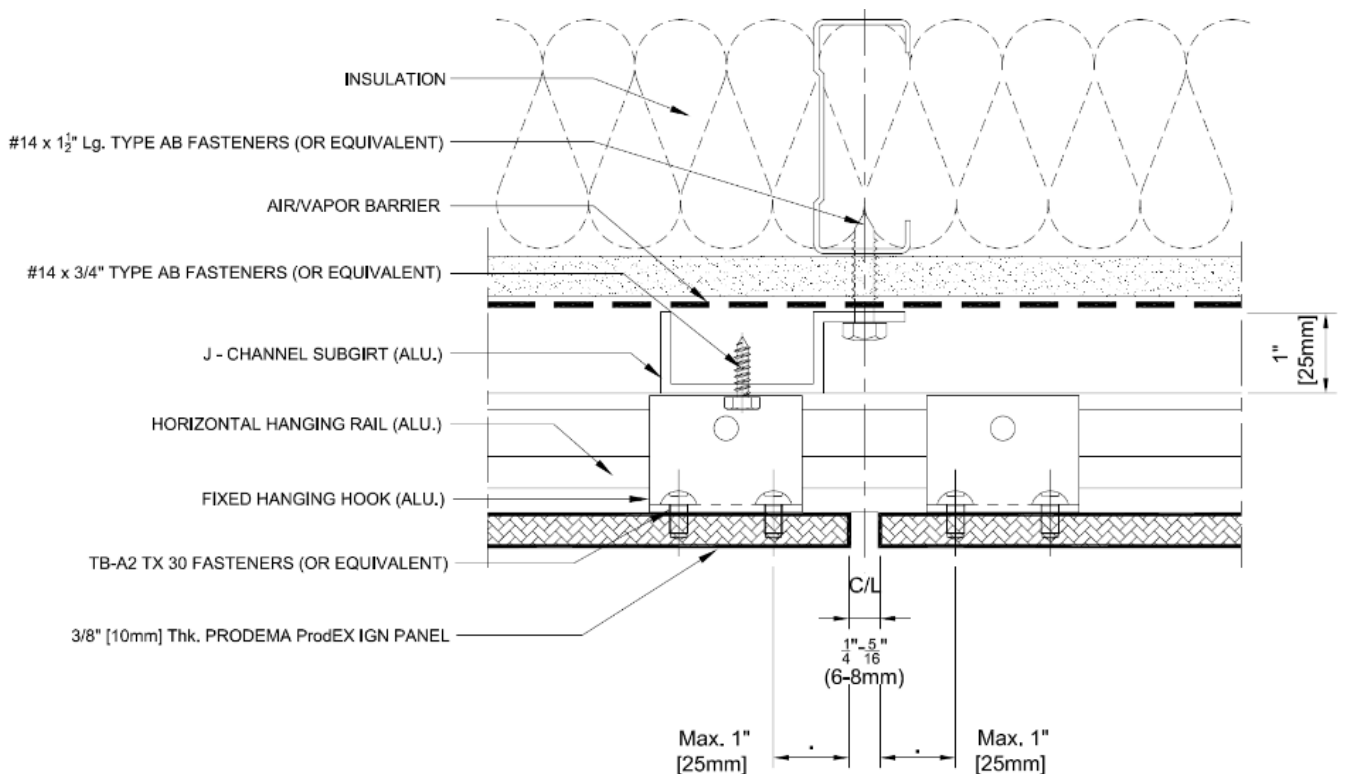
PRODEX IGN WALL PANEL CLADDING EXPOSED FASTENER SYSTEM DETAILS
